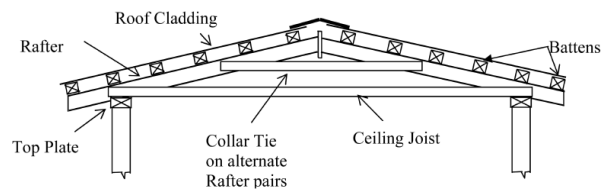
ROOF STRUCTURE OF THE GROUP 4 HOUSE
